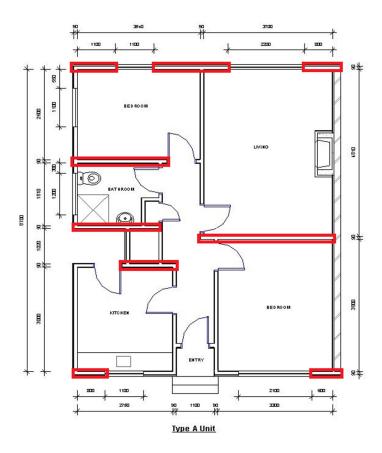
Walls used for bracing in the longitudinal direction Type A.
